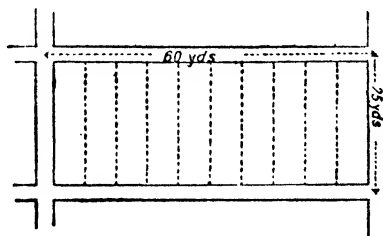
PLAN OF AN OBLONG PILLAR.
